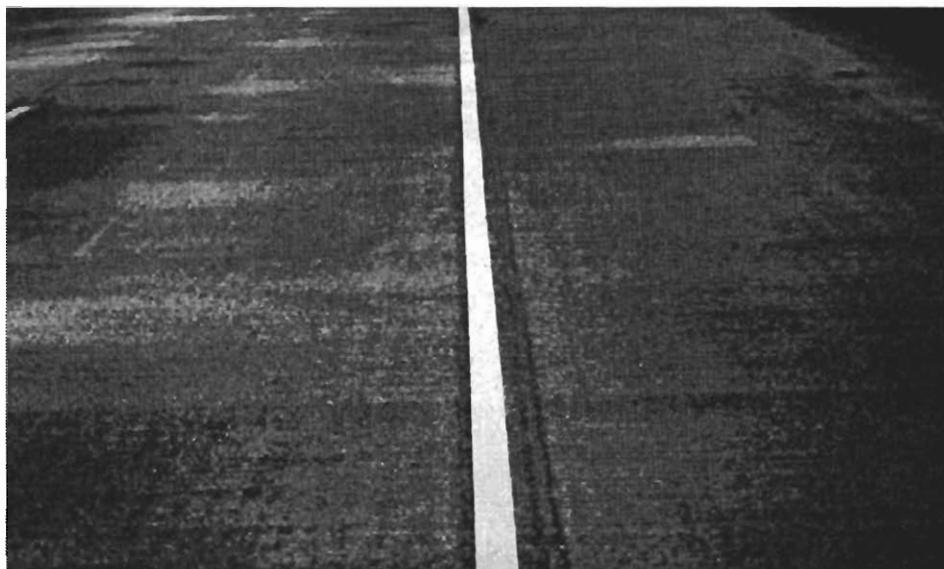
Outside lane and shoulder of Bridge 4 after SFHE overlay placement.
